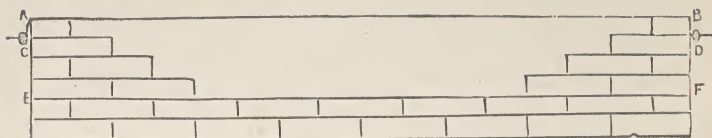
METHOD OF BUILDING A BRICK WALL.
